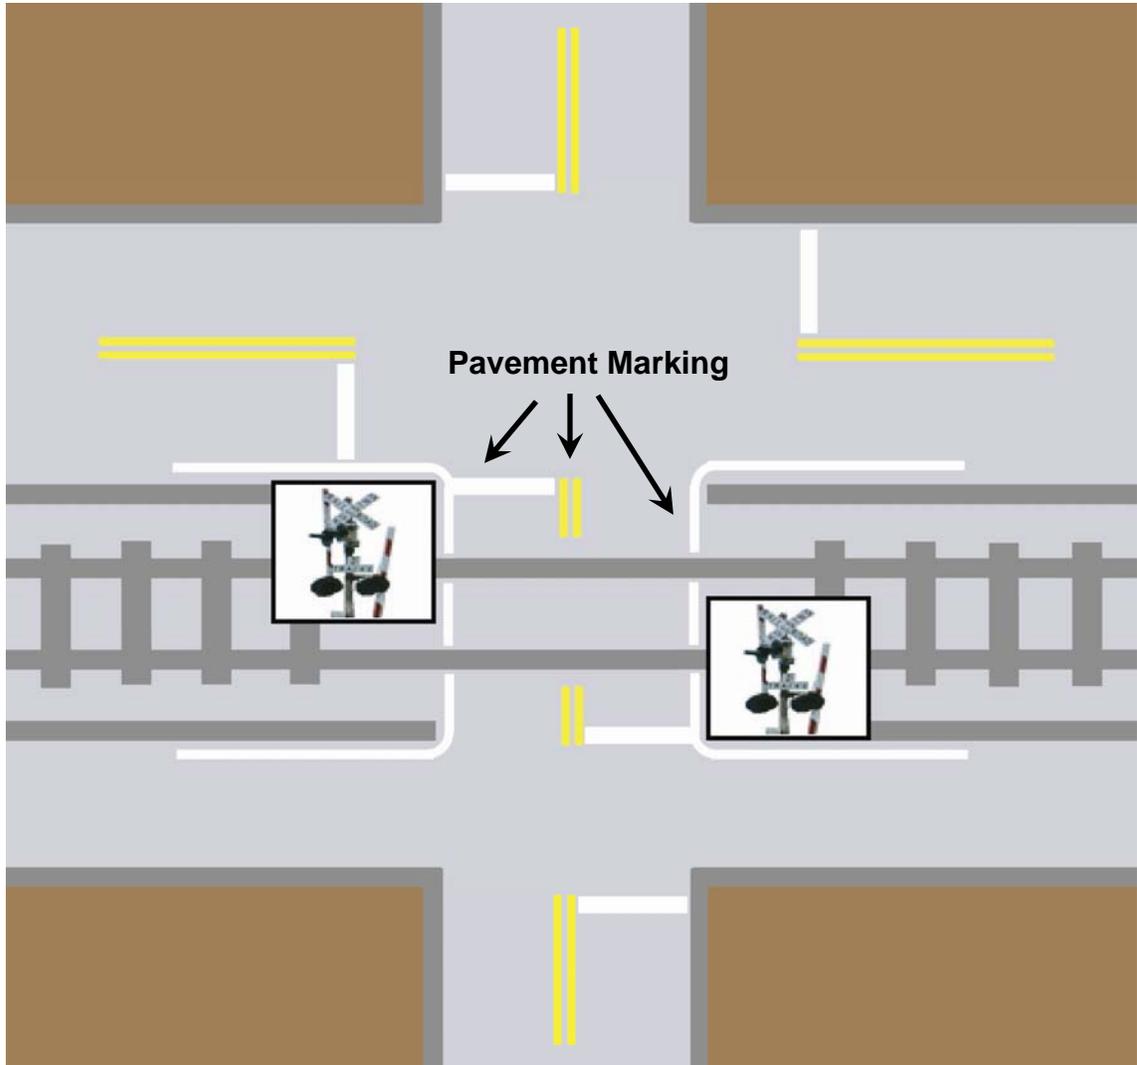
Plan view of treatments (pavement marking) at the Euclid Avenue grade crossing.
